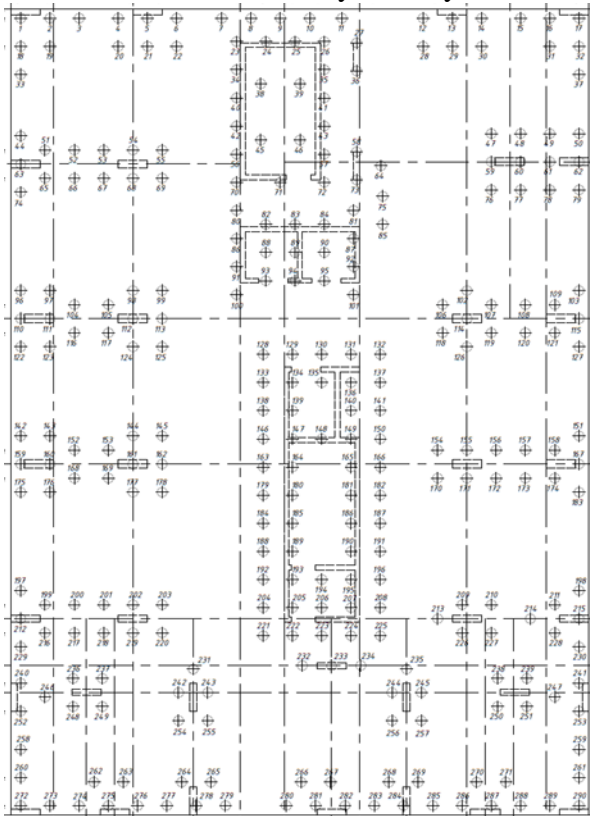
Arrangement of piles in the base pile foundation, 290 units
